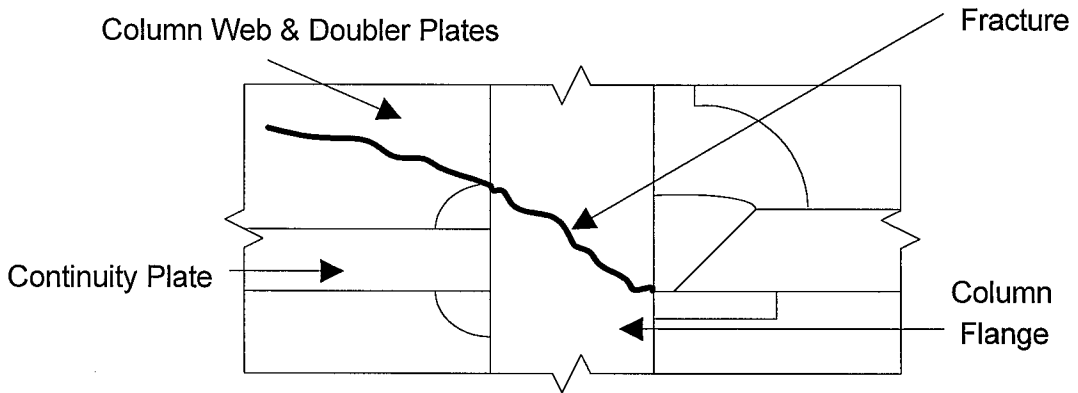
Damage Types P4 & P6 (Column Panel Zone Fracture)
